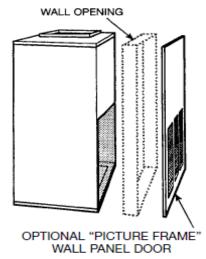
Side View Of A Typical Wall Mount Installation with Wall Panel Door
